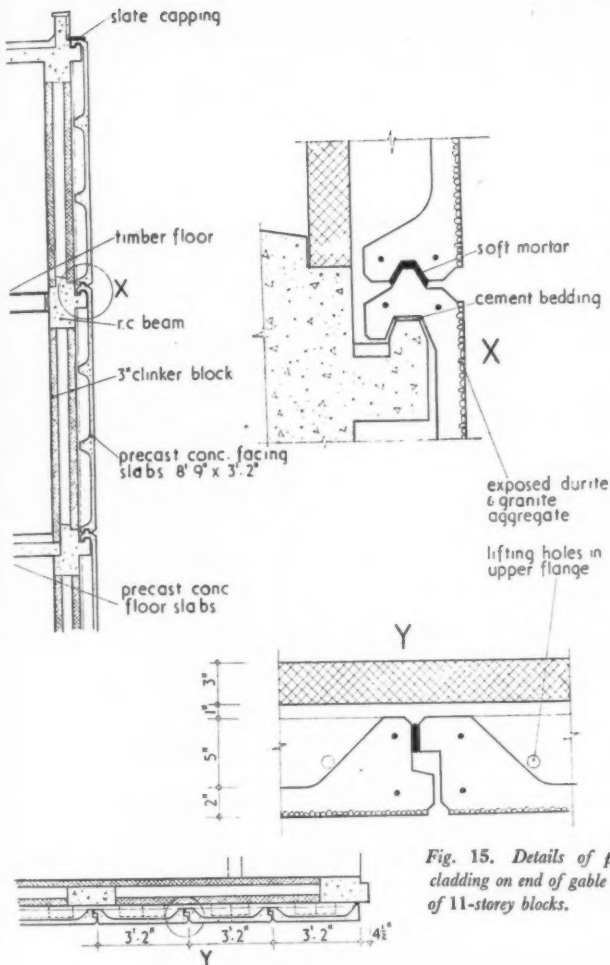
Details of precast cladding on end of gable walls of 11-storey blocks.
